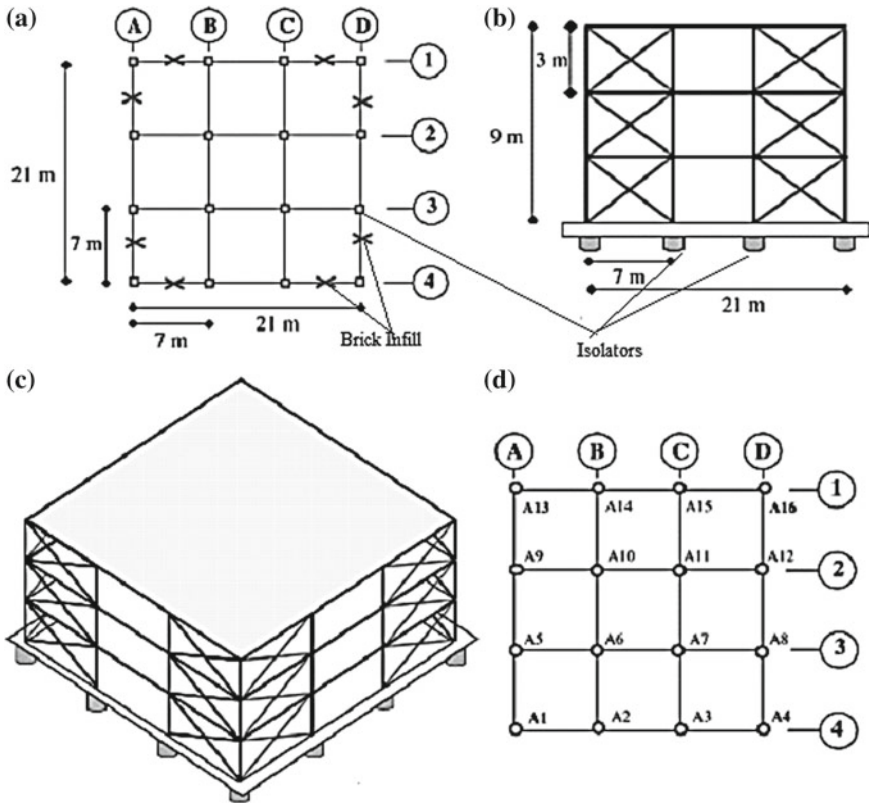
Benchmark models: a plan, b elevation, c isometric view, and d isolation system
